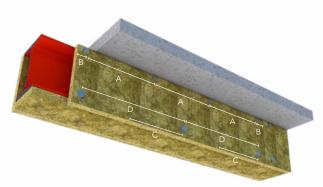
Stud welded pin fixing arrangement 3-sided box with stud welded pins
